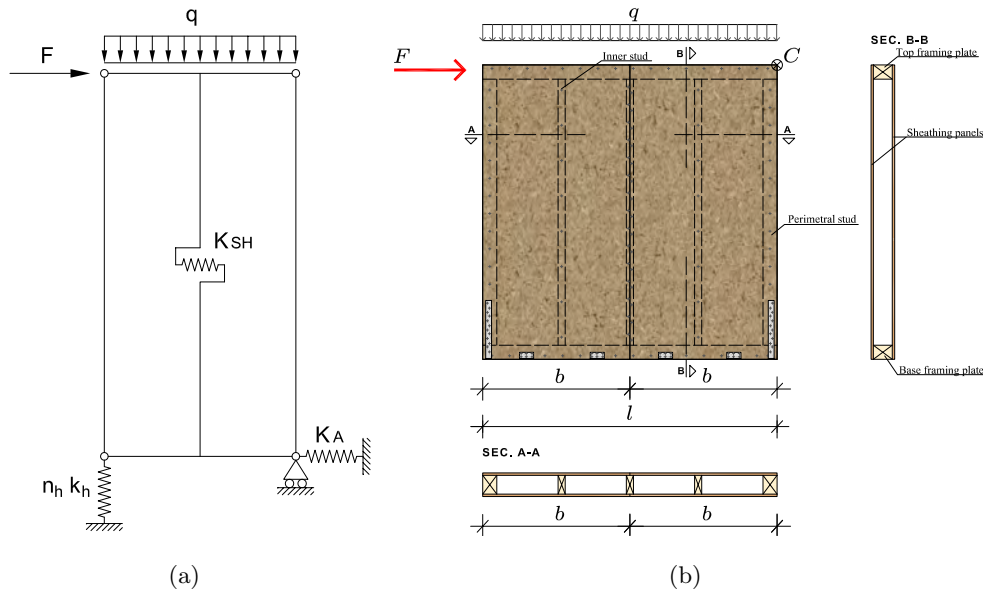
Light timber-frame wall: a) simplified numerical model, b) configuration
